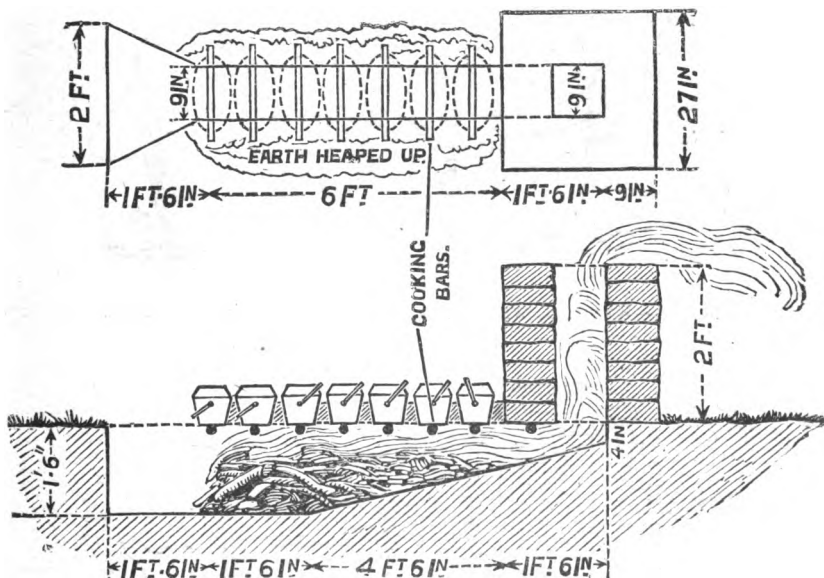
PLAN AND SECTIONAL ELEVATION OF TRENCH-KITCHEN WITH CAMP-KETTLES, TO SHOW DIMENSIONS AND DETAIL.
